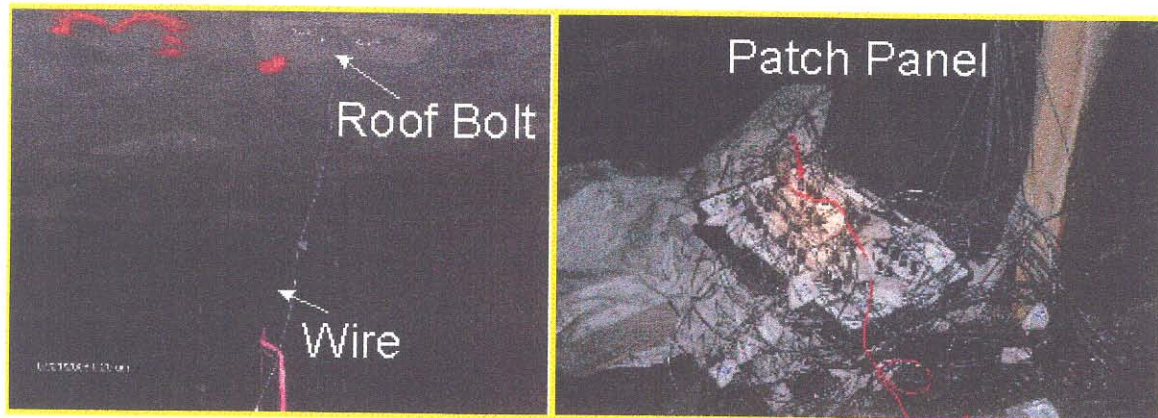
Photos of the underground roof bolts, wire leads, and patch panel equipment.
